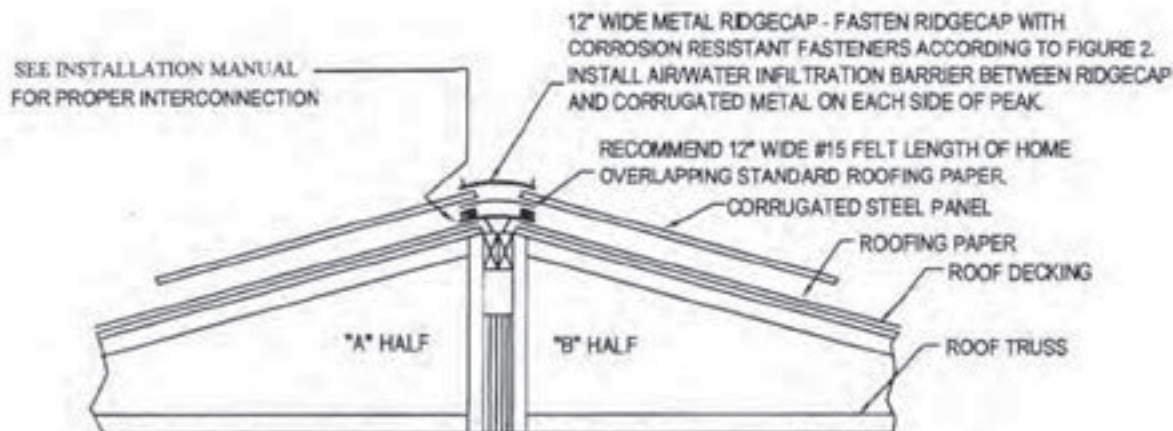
RIDGE CONSTRUCTION FOR CORRUGATED METAL ROOF
